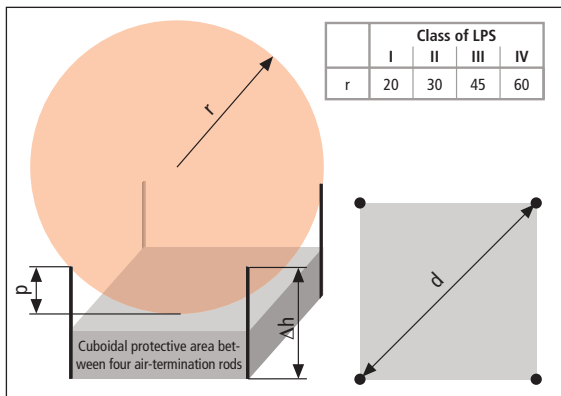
Air-termination system for installations mounted on the roof with their protective area
